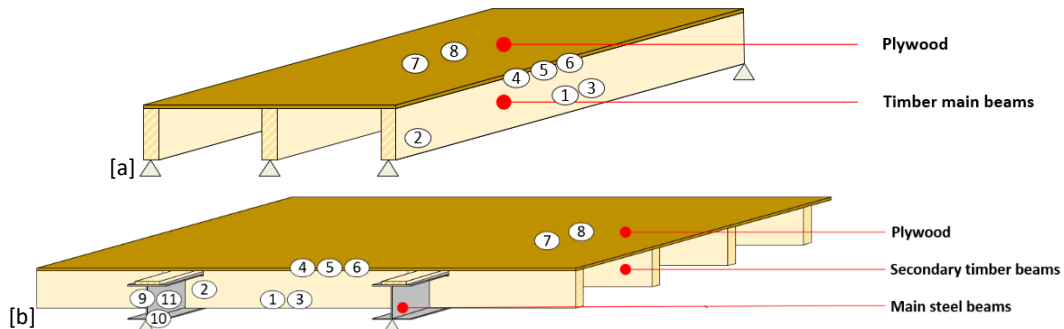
3D overview of floor and roof system; [a] Basic system for both floor and roof; [b] Adapted floor system for span 5.8 - 6.6 m (Self-produced).
